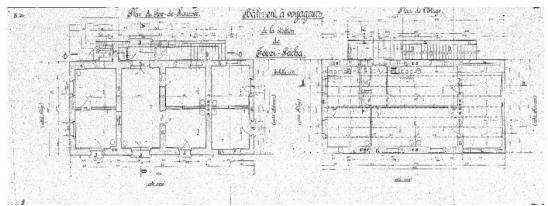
Project drawn for Fevzipaşa / Ground and first floor plans
